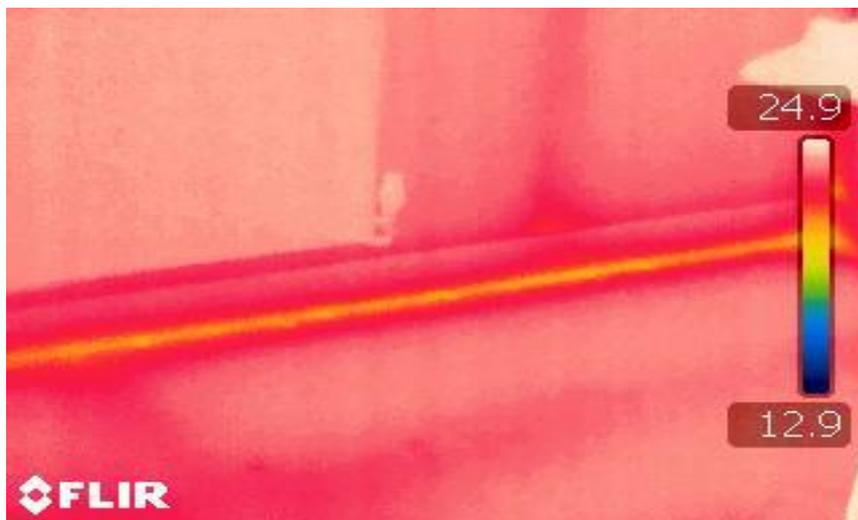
Floor to Wall Joint – Uniform Heat Loss Phase 2
